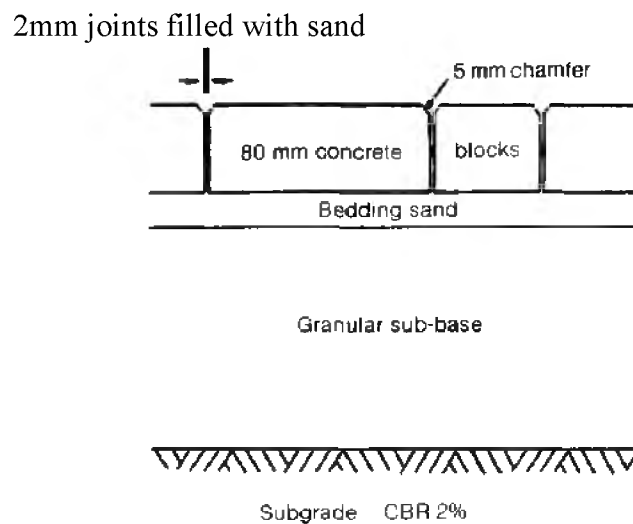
Typical Section of Segmental Block Pavement (Barber and Knapton 1979)
